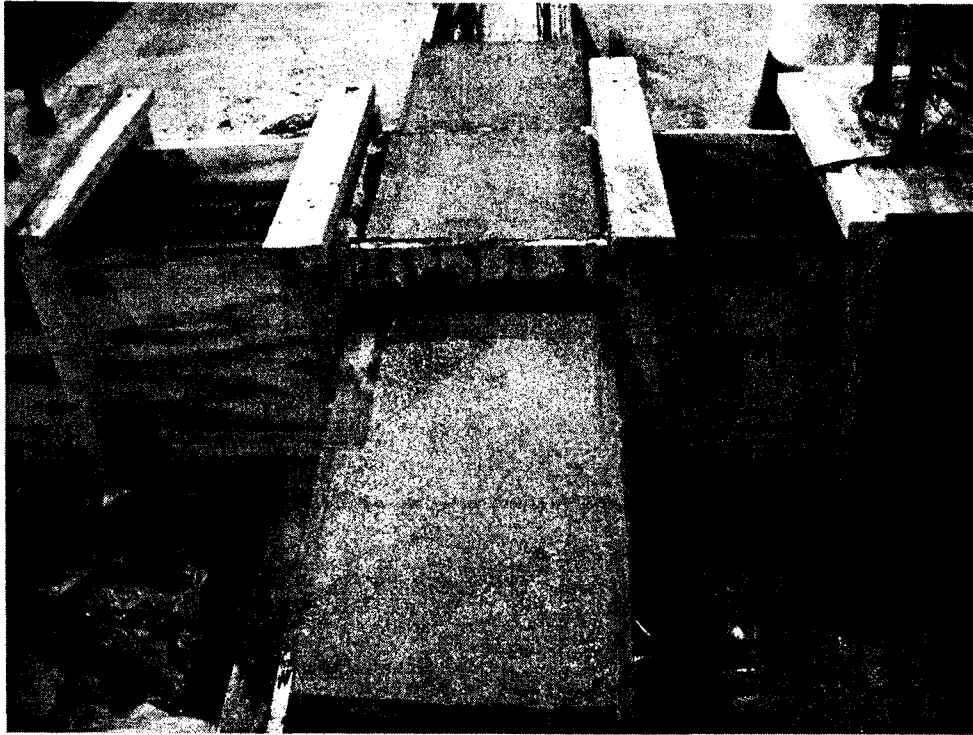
Finishing of HPFRCC portion of the beam-column specimen
